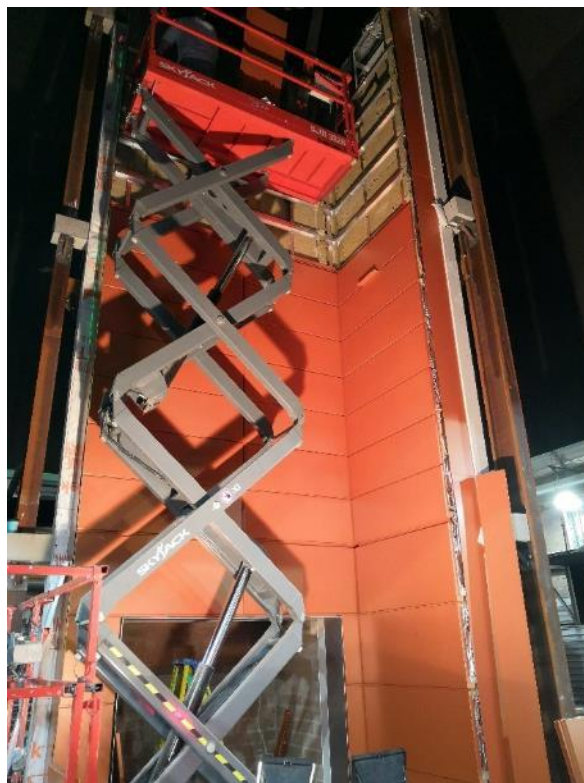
Dri-Design cassettes installation on the railing support system.
